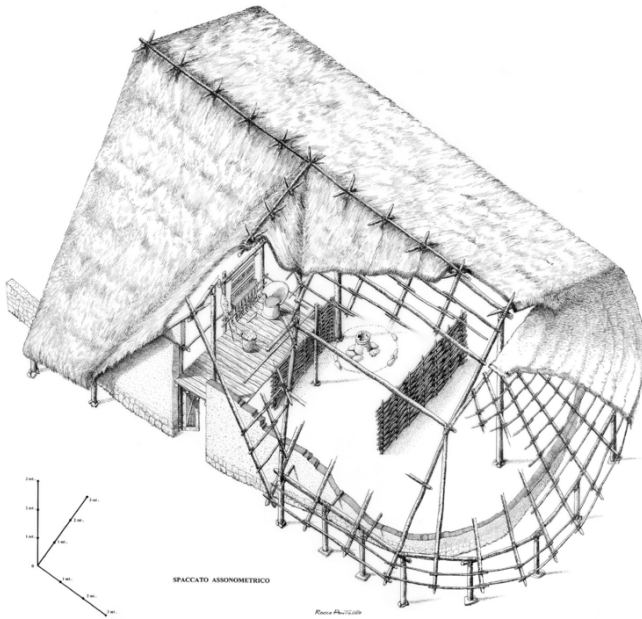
Torre di Satriano: reconstruction of the apsidal building (by R. Pontolillo).
